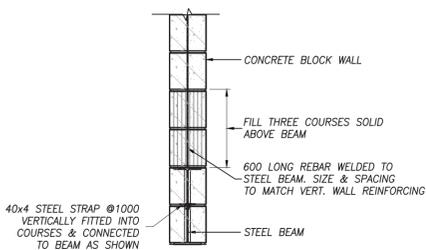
DETAIL OF ANCHORAGE OF STEEL COLUMN TO MASONRY WALL
